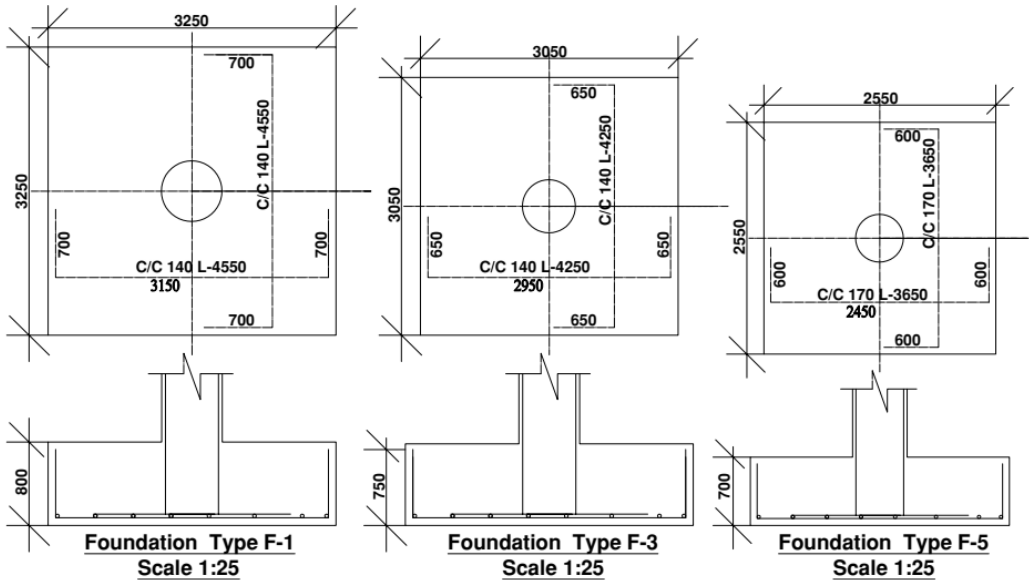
Sample foundation detailing for G+7 building with C-40 concrete
